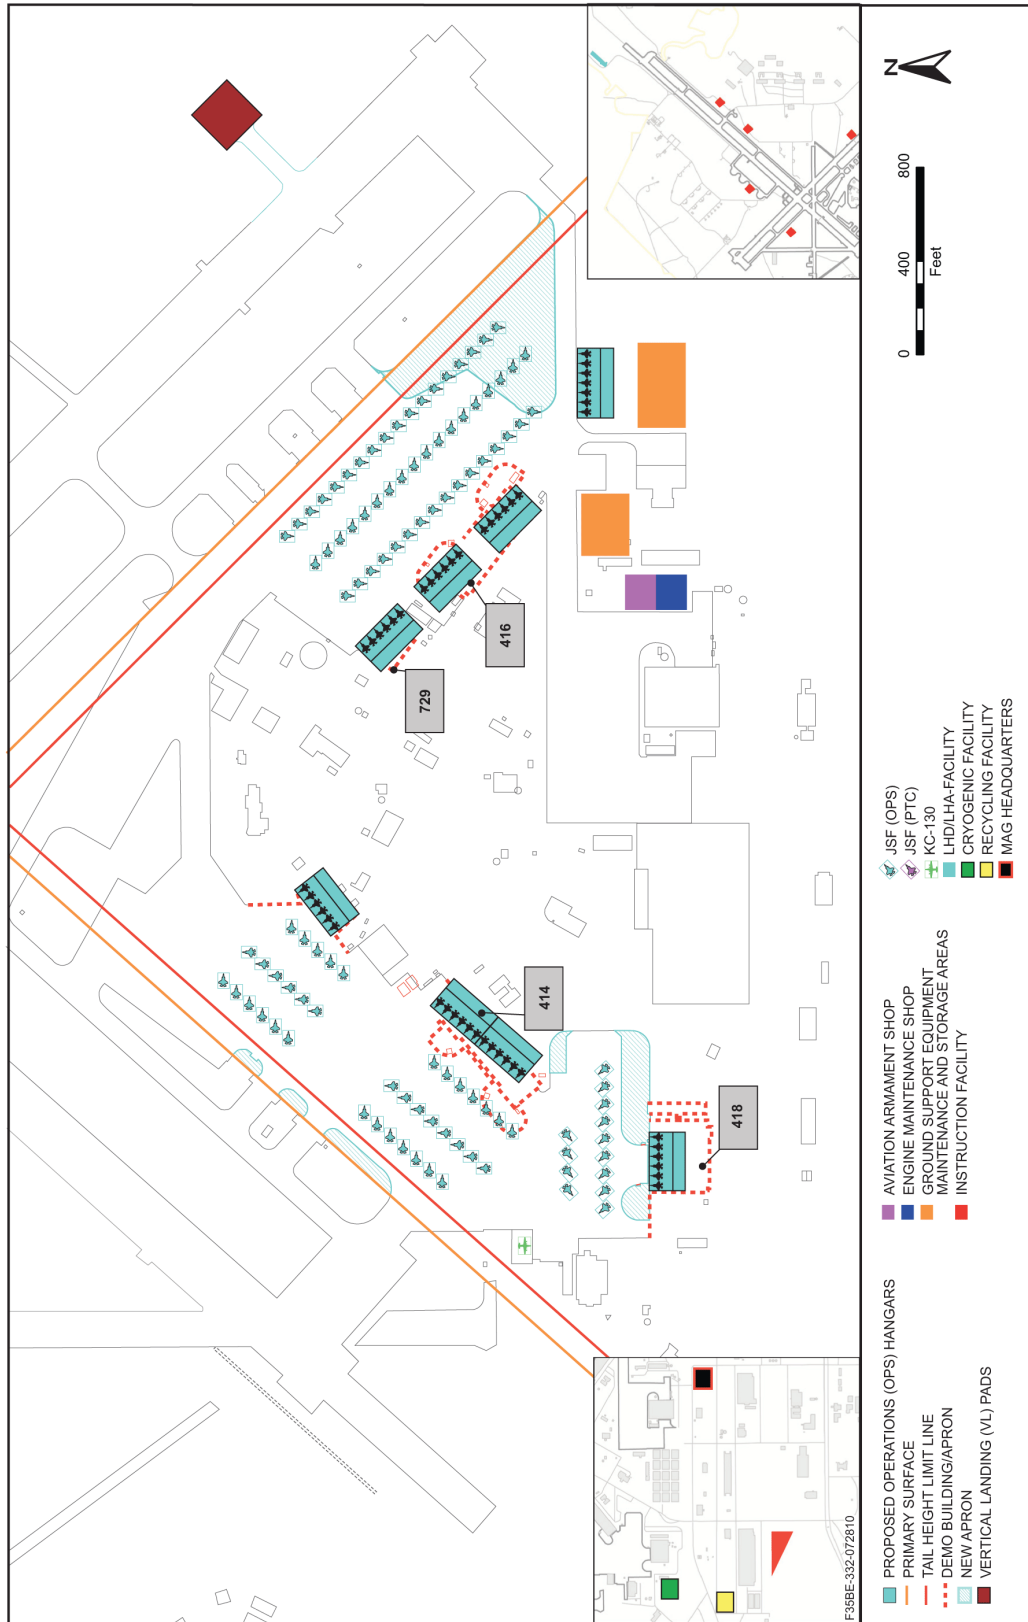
Alternative 1 (Preferred Alternative) Proposed Aircraft Flightline and Support Facility Construction at MCAS Beaufort
